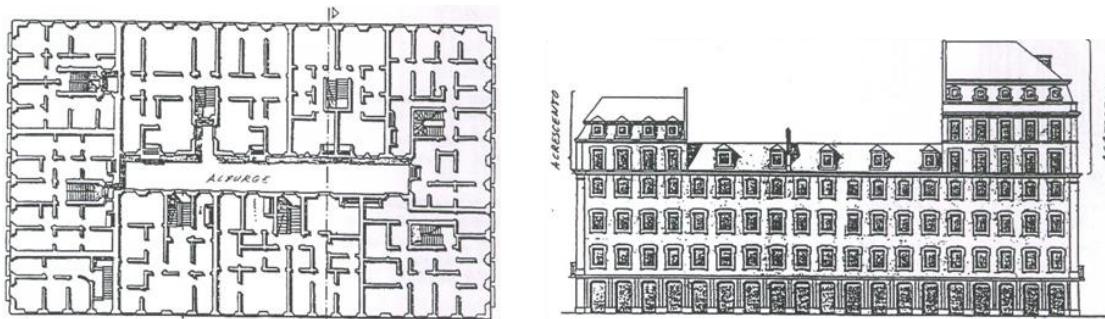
First floor plan and elevation of a block from the Pombaline Quarter - MASCARENHAS, 2009: 64
